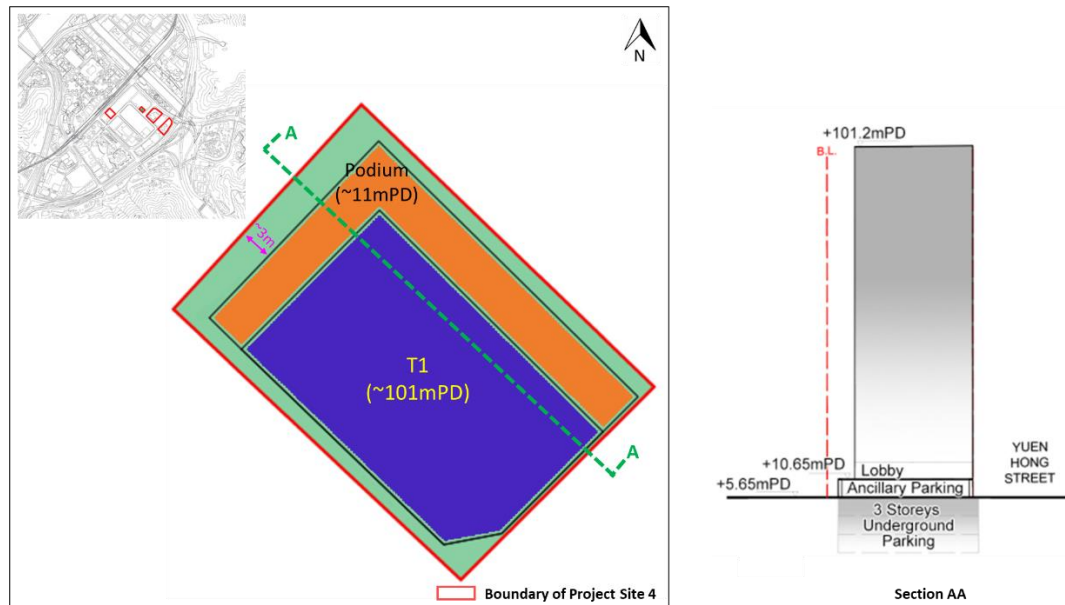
(d) Indicative Development Layout and Cut Section within Project Site 4
